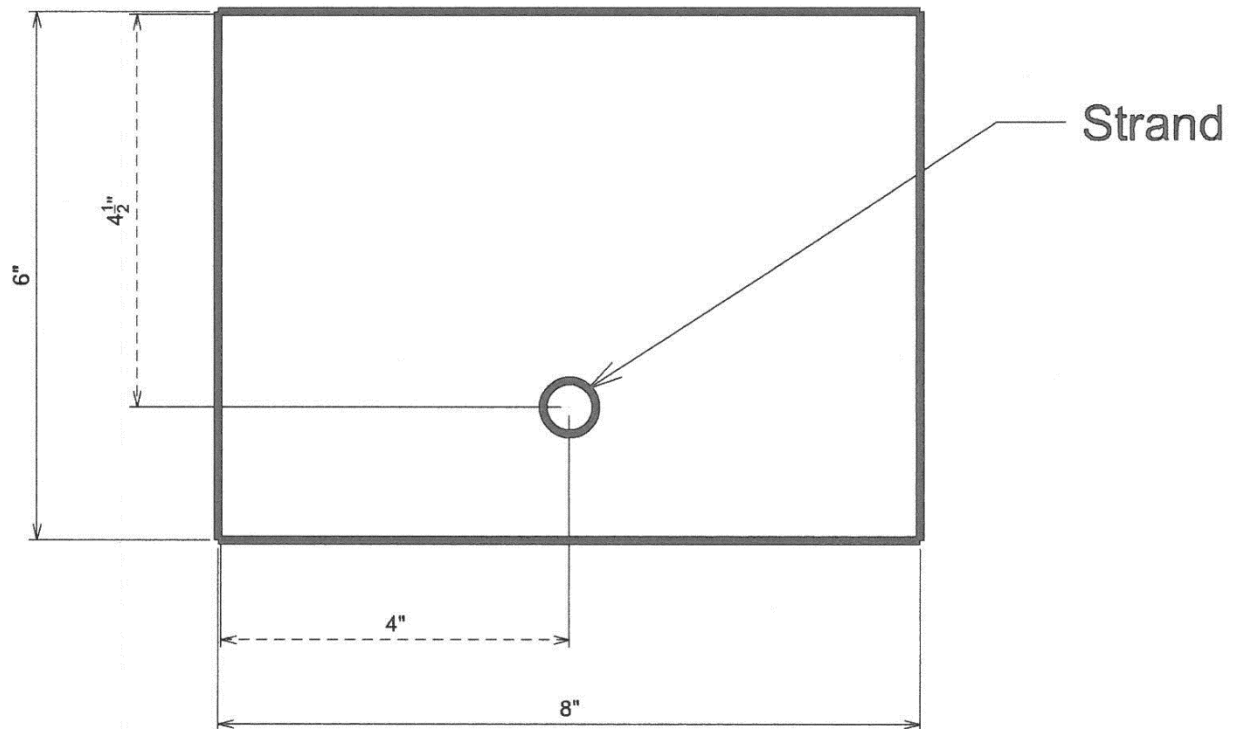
This drawing shows a cross section of the quality assurance test beam. (1 in = 25.4 mm) Dimensional tolerance: +/- 1/8 inch
